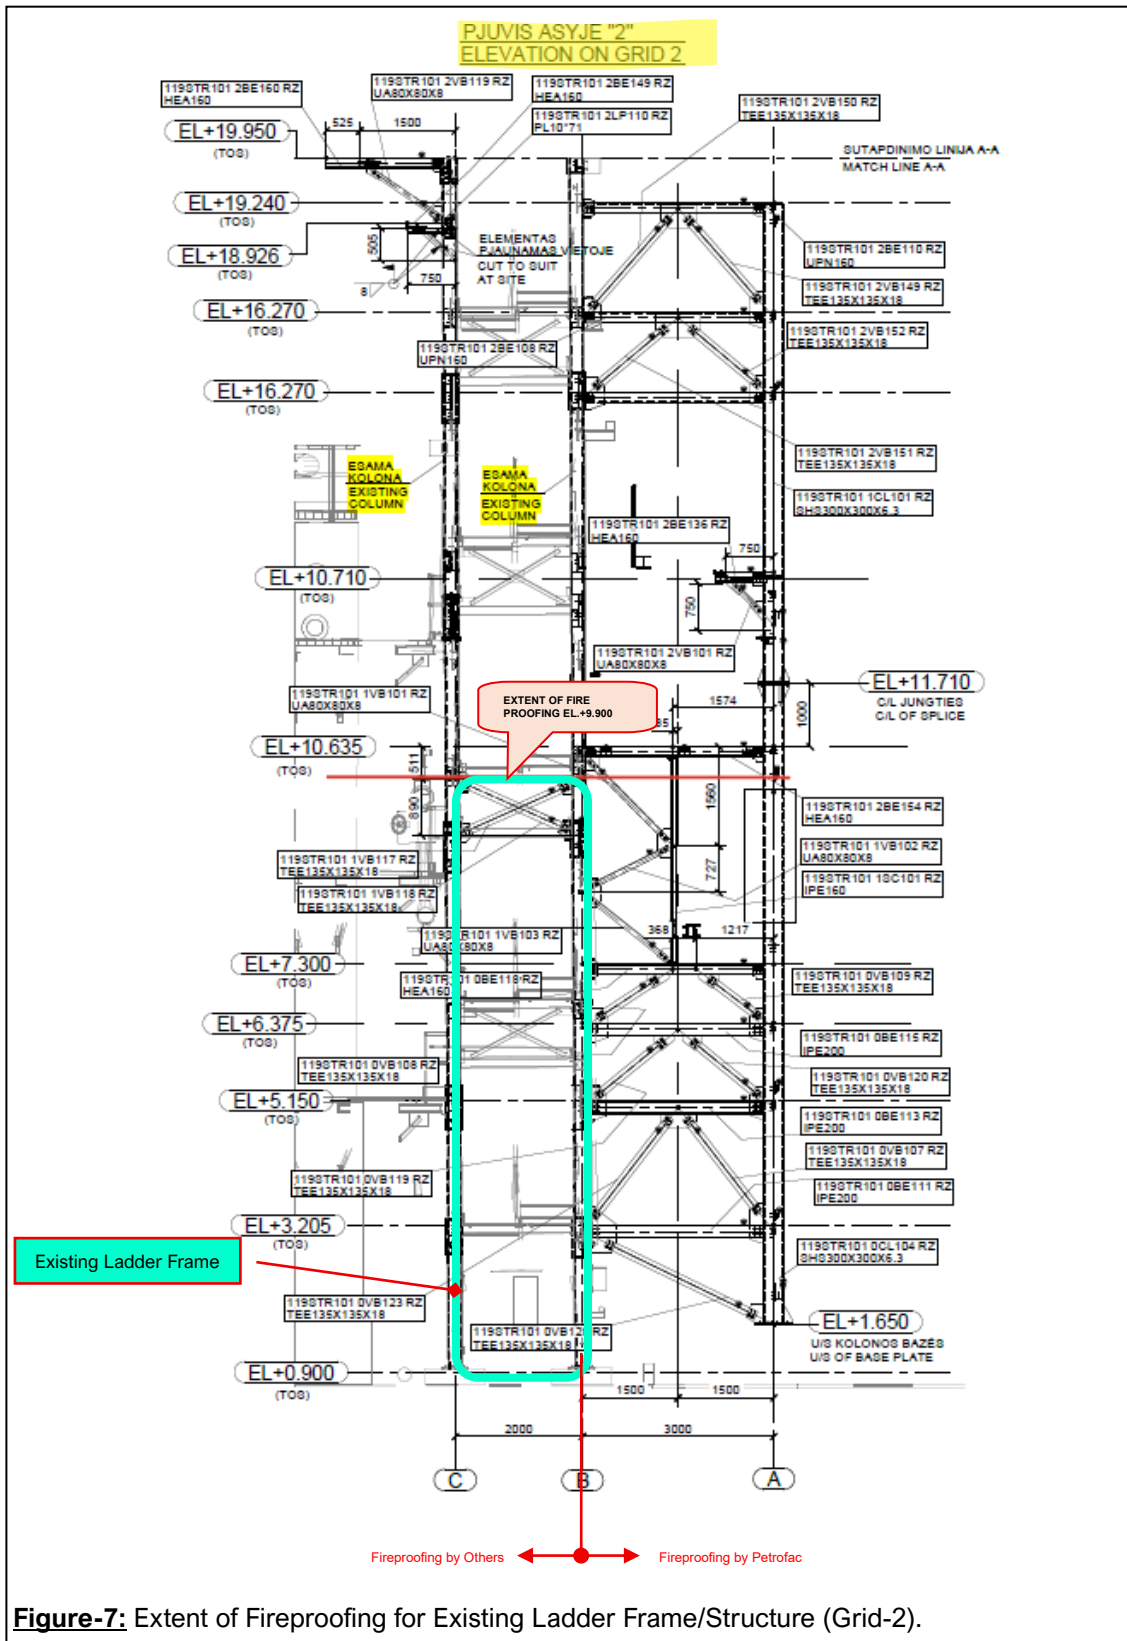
Extent of Fireproofing for Existing Ladder Frame/Structure (Grid-2).
